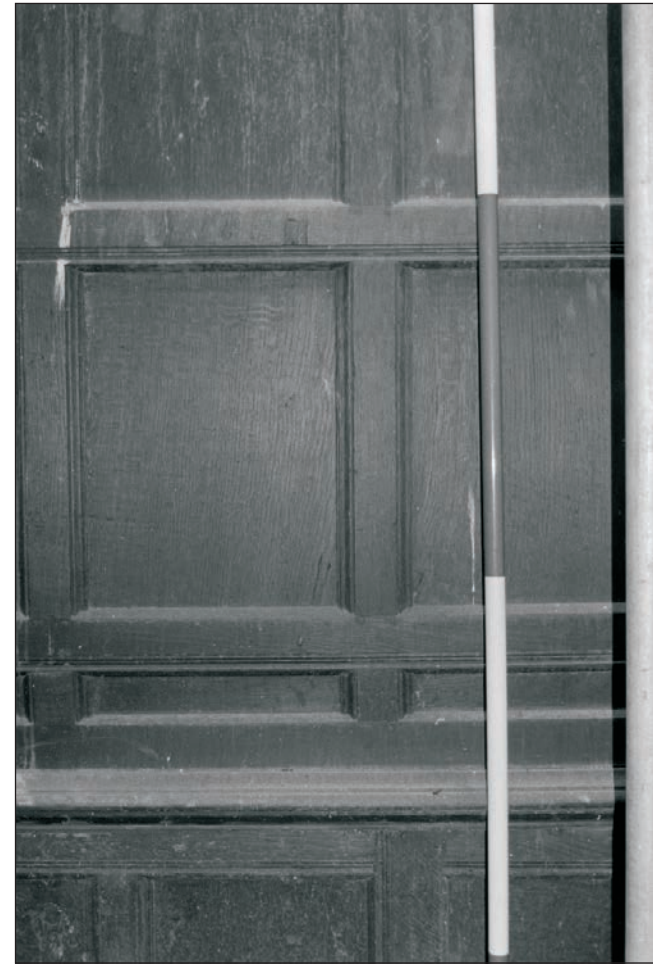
Detail of the Type 2 oak panelling on the south wall of room G3, Building 4 (Film 29.17)
